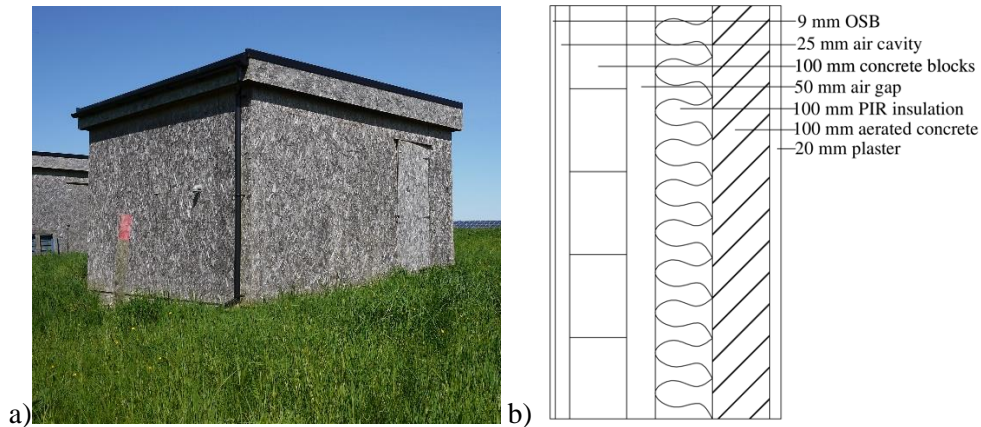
a) test building b) Vertical section of the Concrete Block Masonry wall
